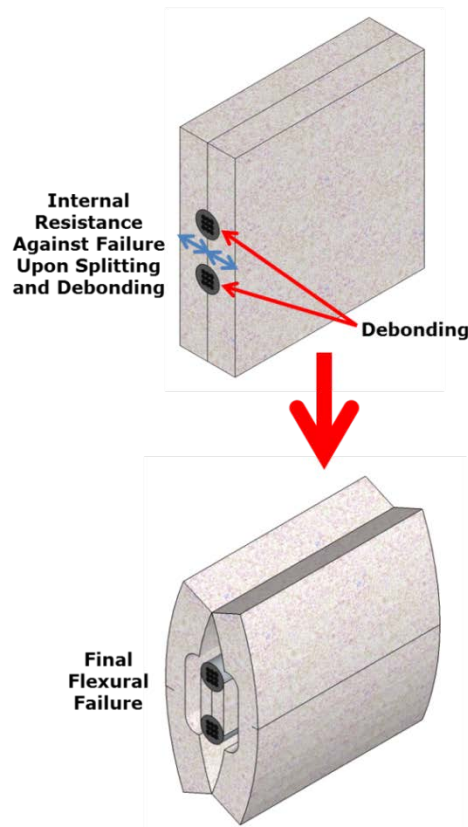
Difference in Failure Behaviors for Panels with One or Two Ducts
